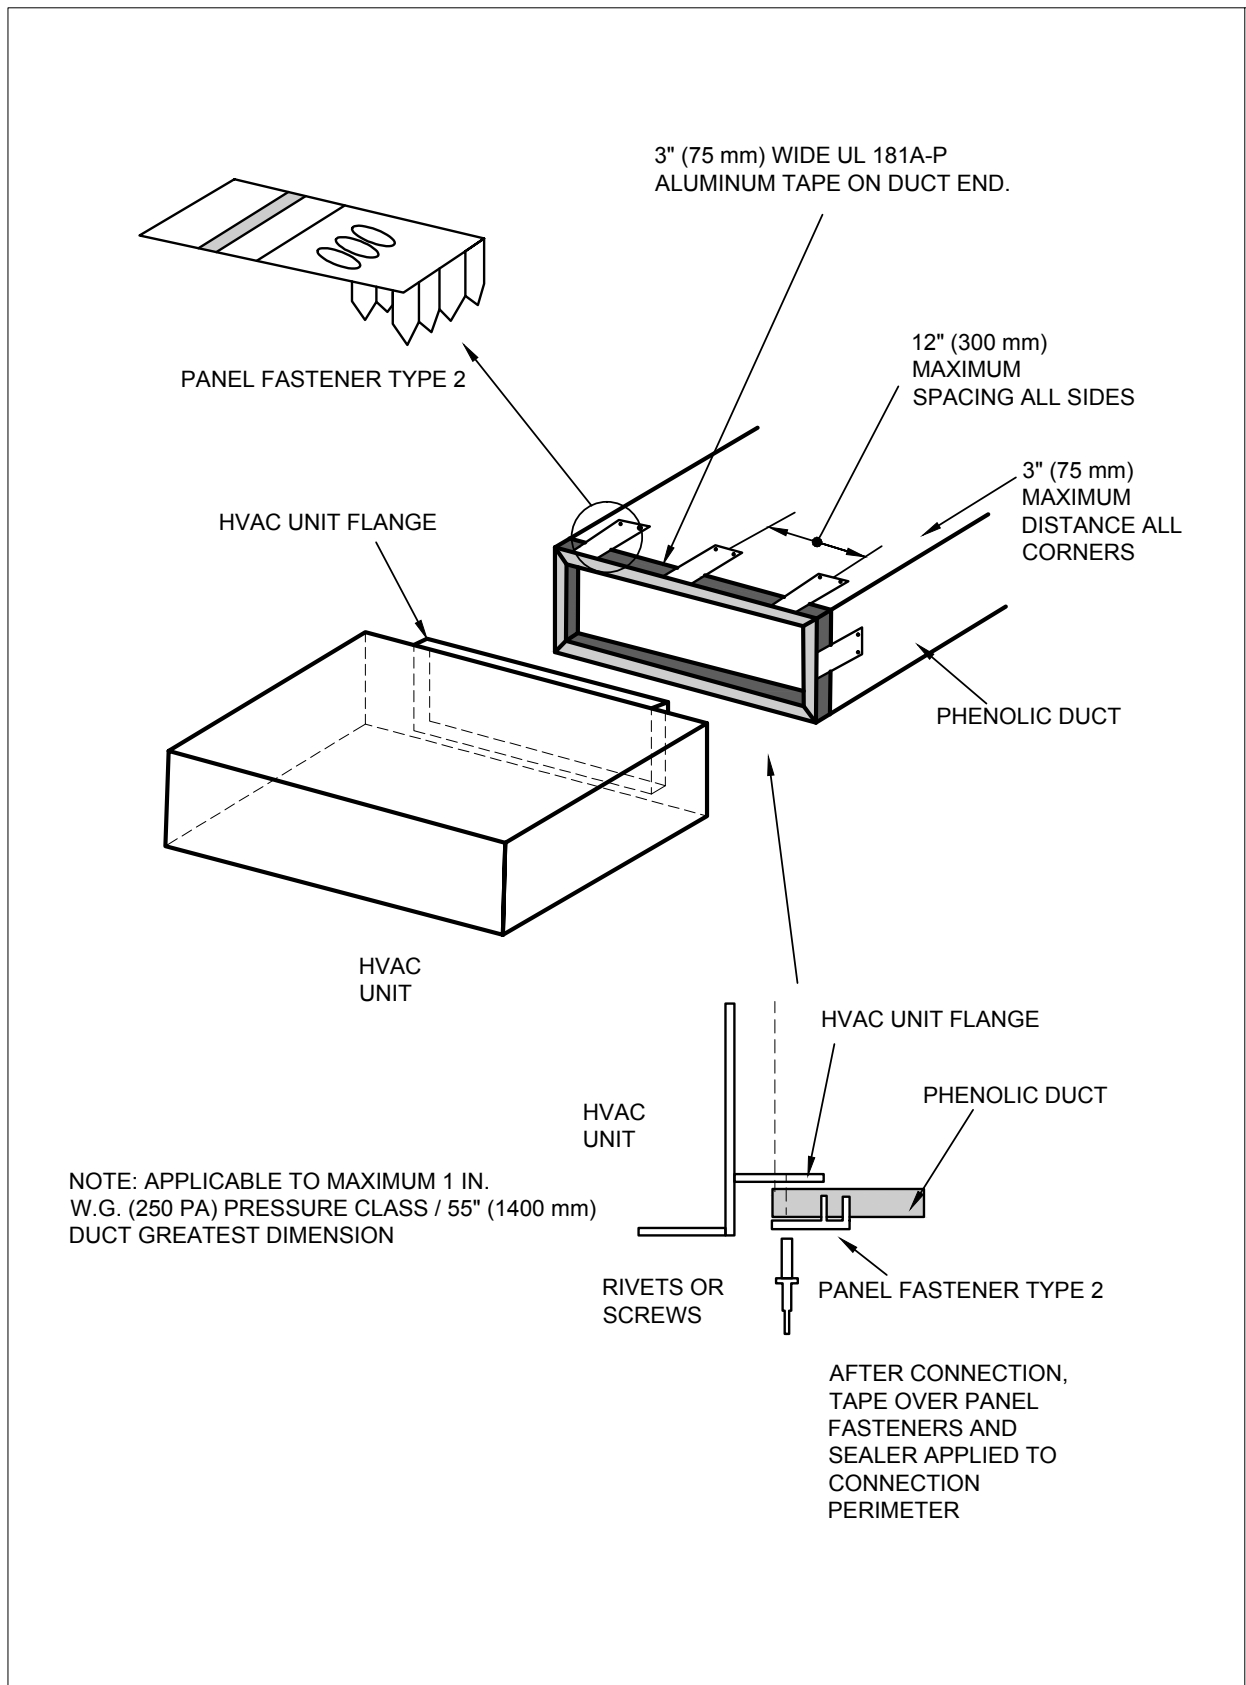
HVAC EQUIPMENT CONNECTIONS – NON-FLANGED
